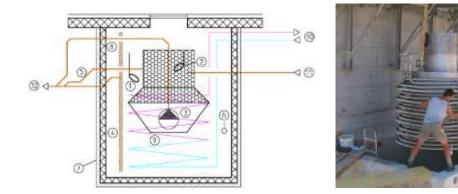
Heat exchanger in a sewer collection pit. Applicable at apartment buildings and flats. (source: www.feka.ch)
